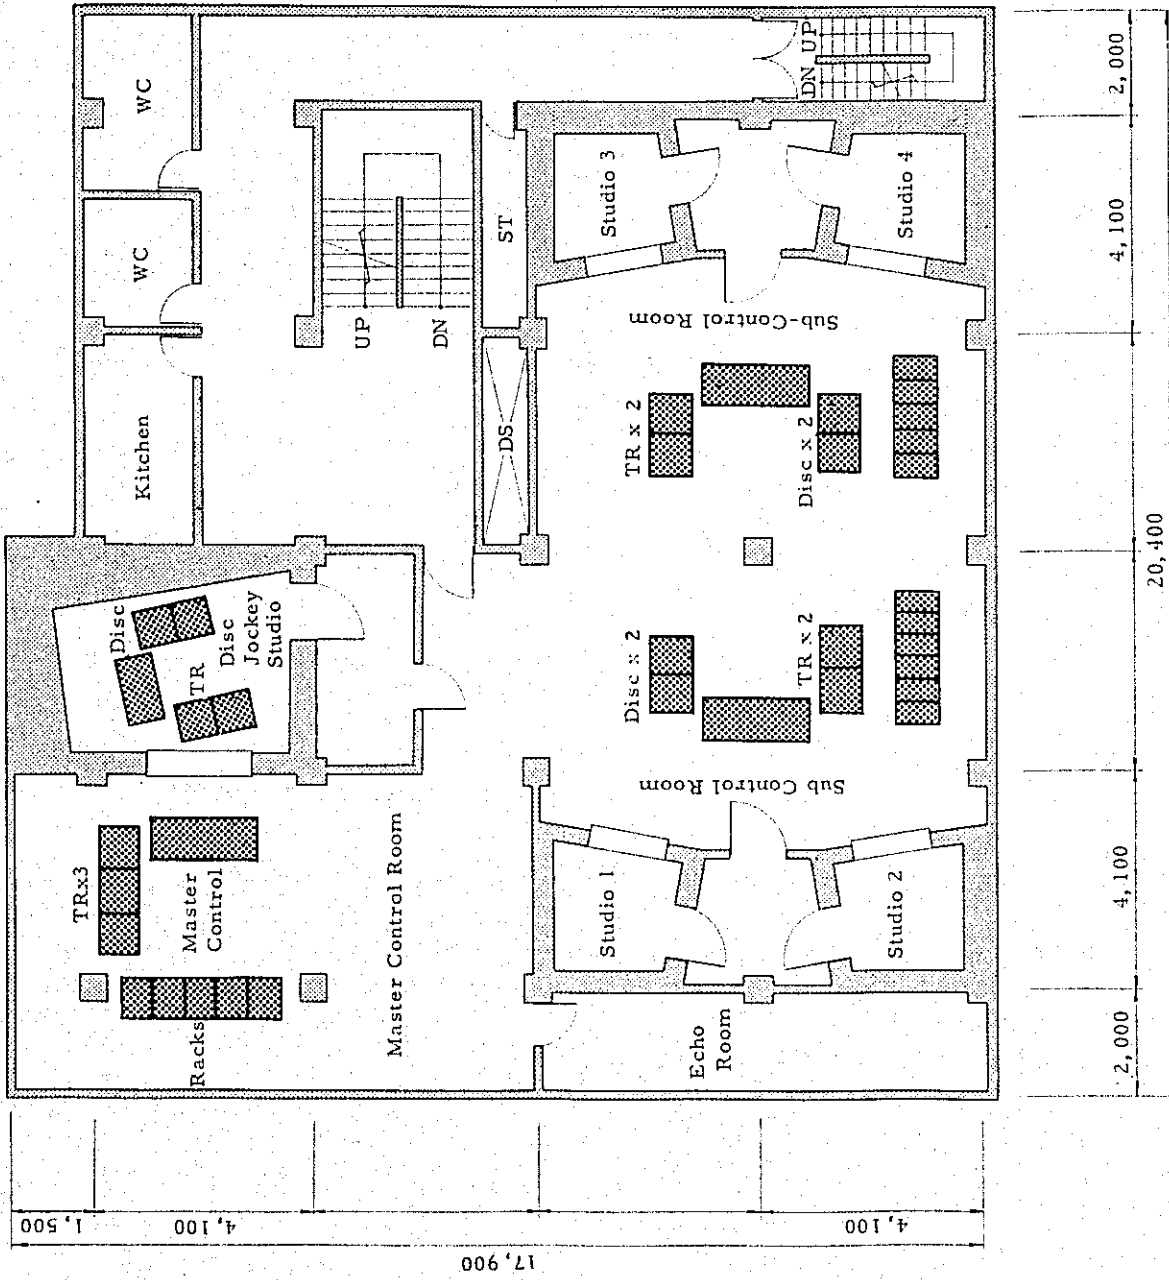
Lay out PLAN of New Radio Studio Building - 3F PLAN
